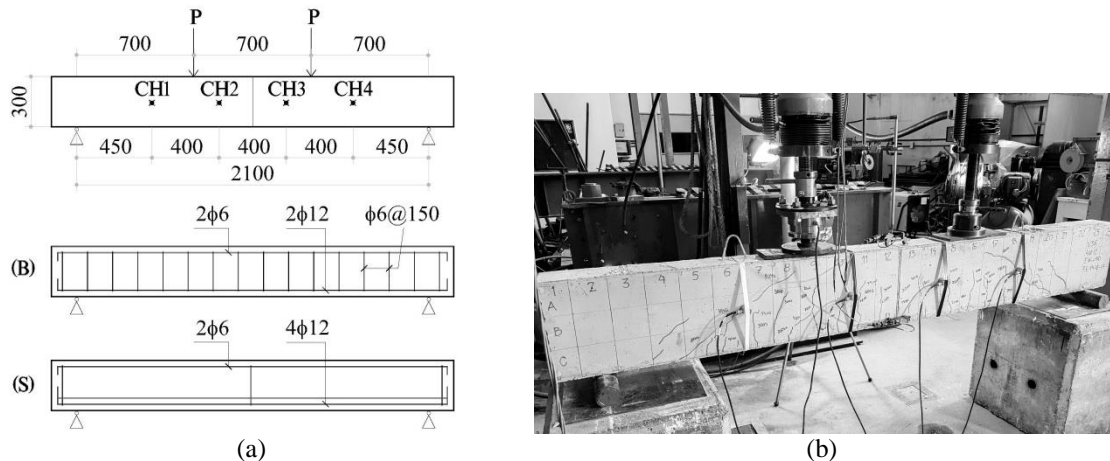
(a) Geometry and reinforcement details: bending B and shear S beams. (b) View of the experimental test layout.
